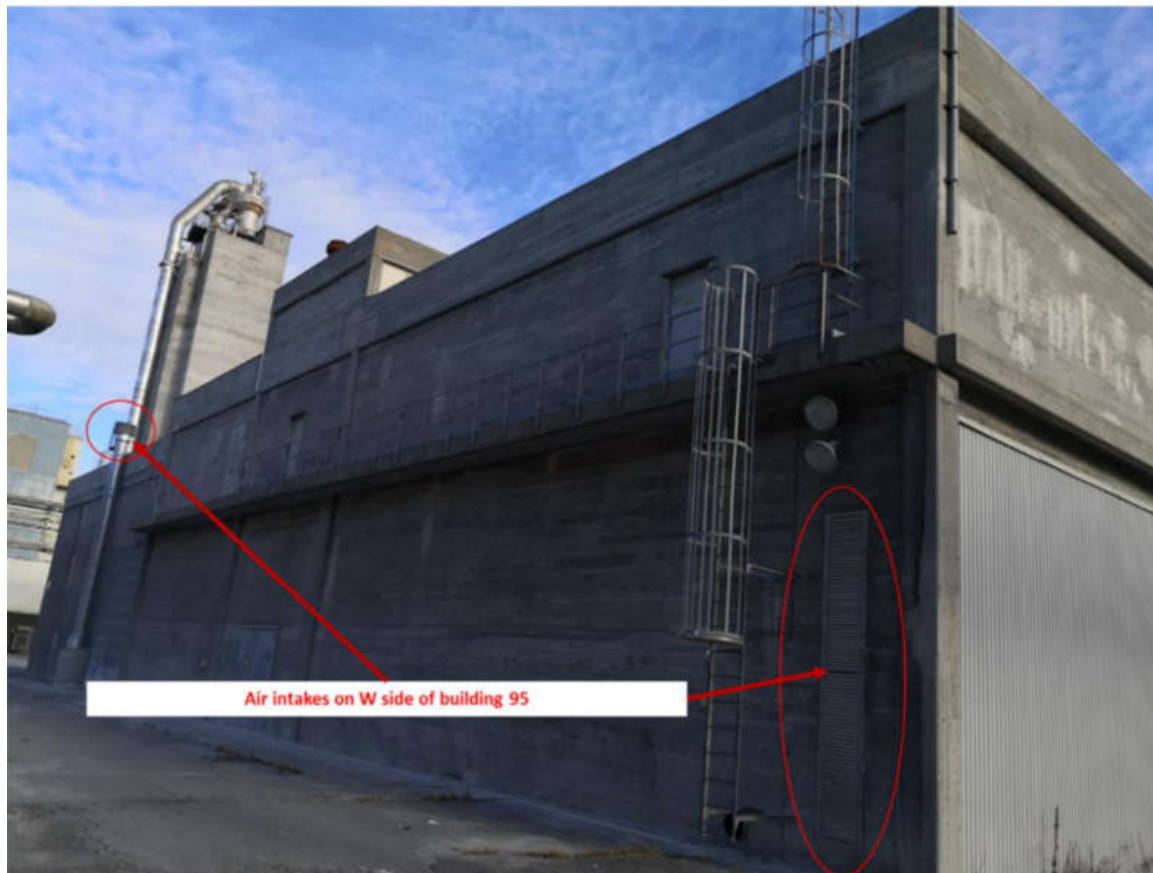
Air intakes to building 95, located on the W side of the building (facing the e-fuel plant)
